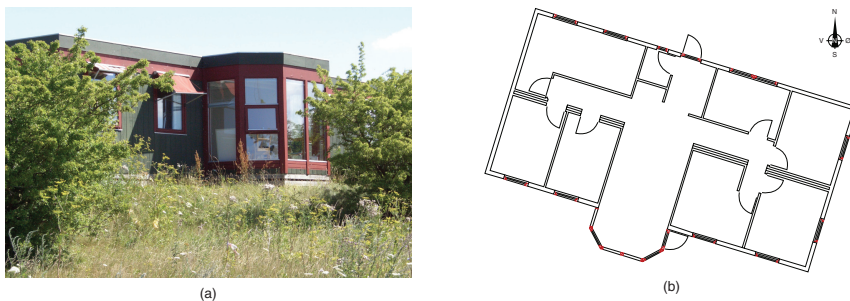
PowerFlexHouse south facing facade (a) and building layout (b).
